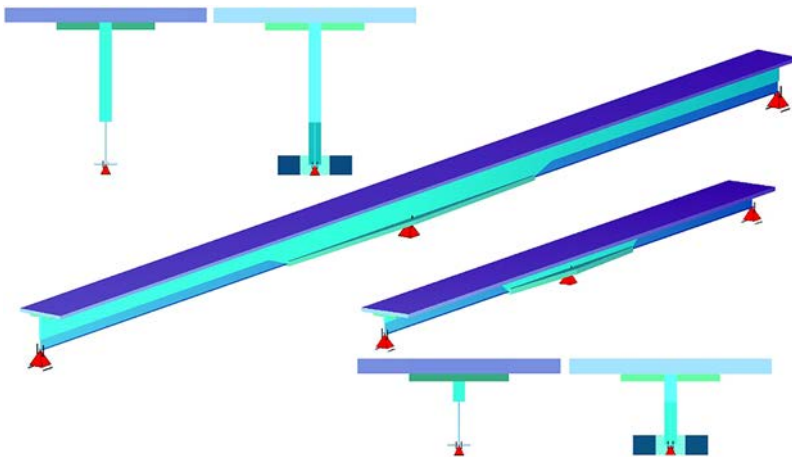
3D view and cross sections of a finite element model of the considered beams – 40 (upper-left) and 20 m (lower-right) span lengths (structural steel highlighted in blue, prefabricated concrete in cyan, and in-situ concrete in violet)
